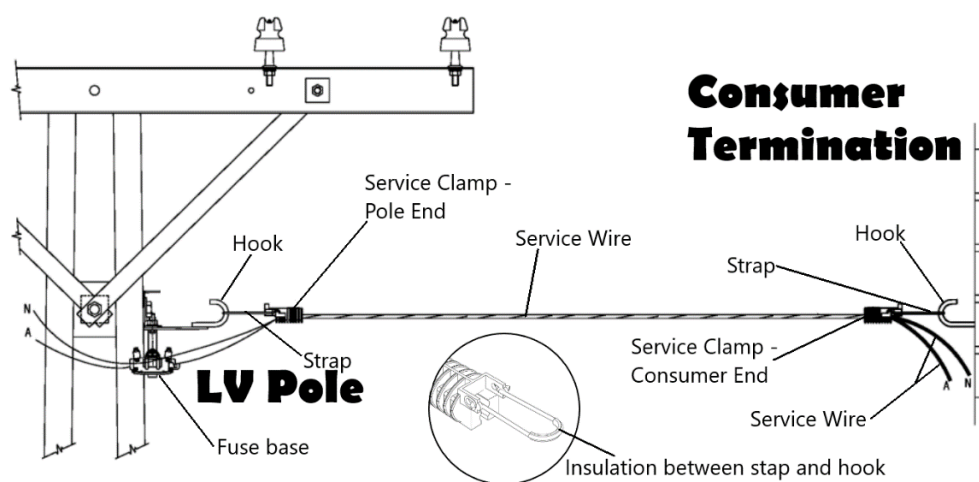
Service Connection Assembly drawing (Power and Water internal drawing)
